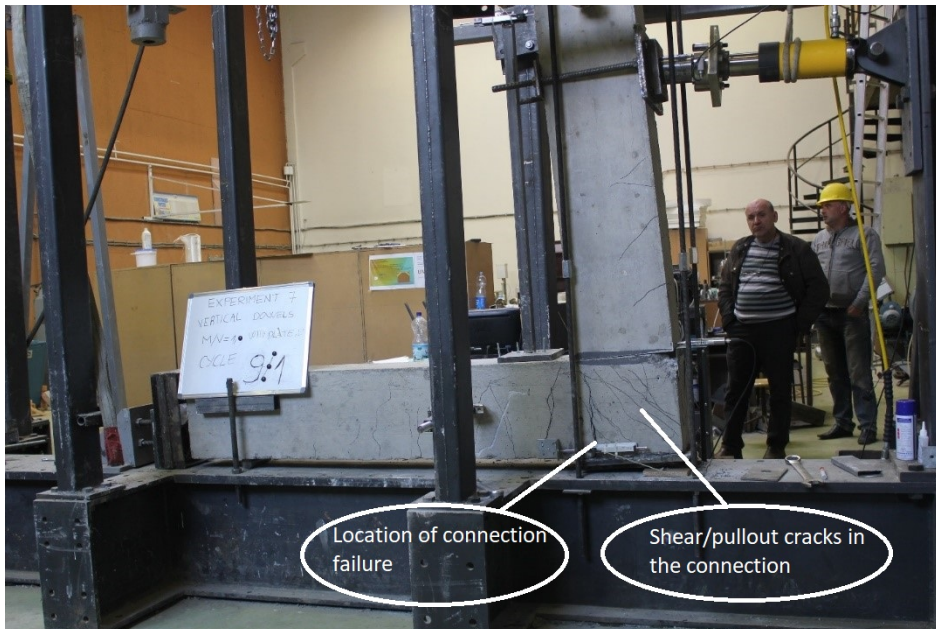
Crack distribution on specimen "S 7, V.D." after failure
